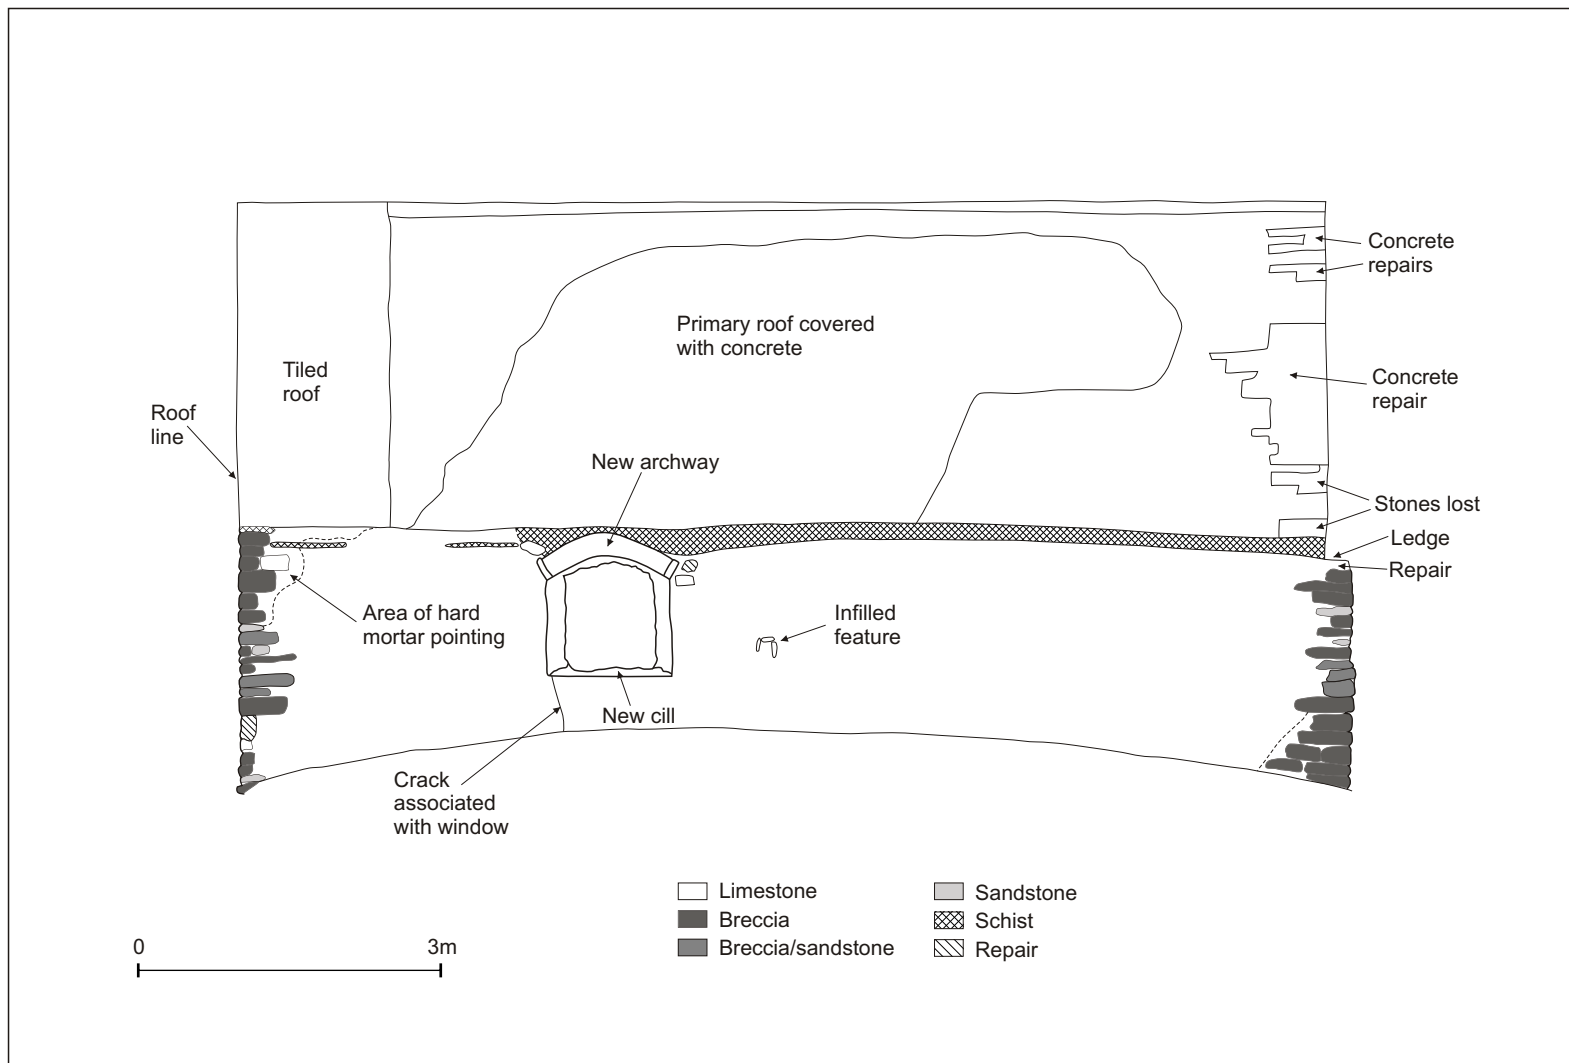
St Michael's Chapel, Torre north elevation measured drawing
